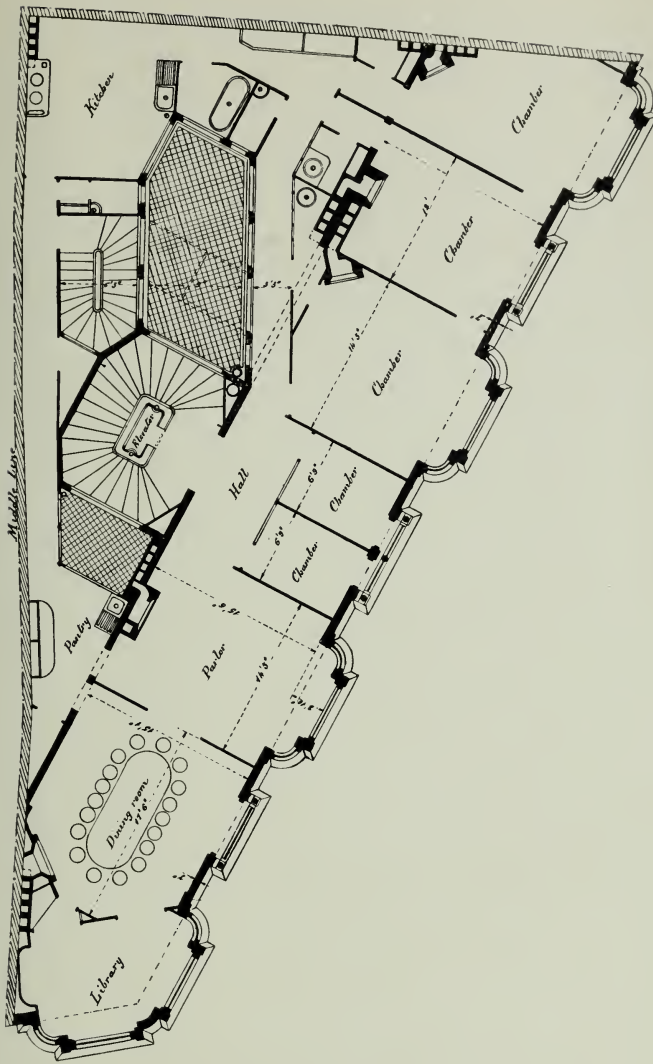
Hennebique's Apartment House. Third floor plan.
